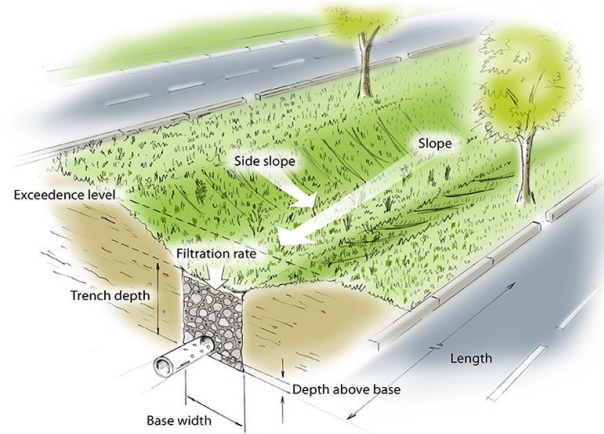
Typical Median Construction to Manage Stormwater Runoff
